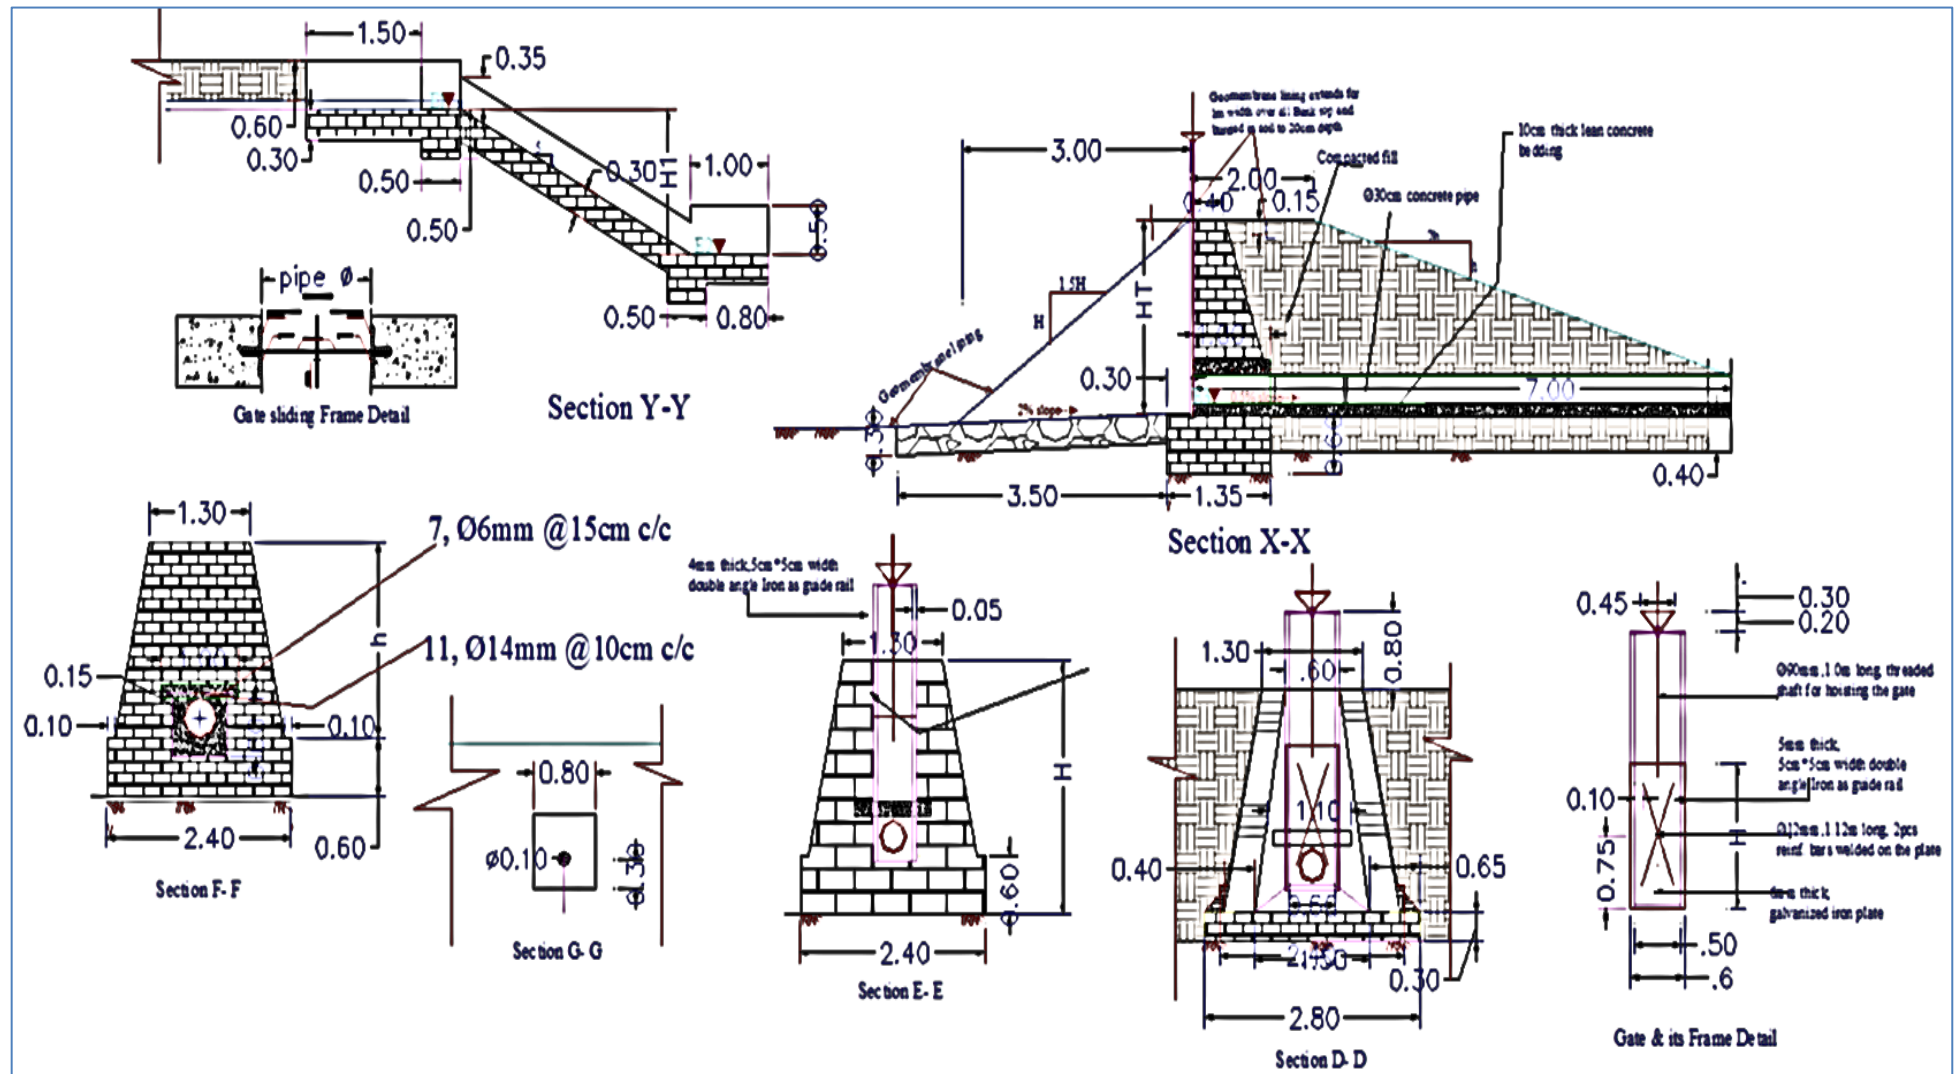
Typical earthen night storage reservoir, sections of inlet, outlet &amp; gates
